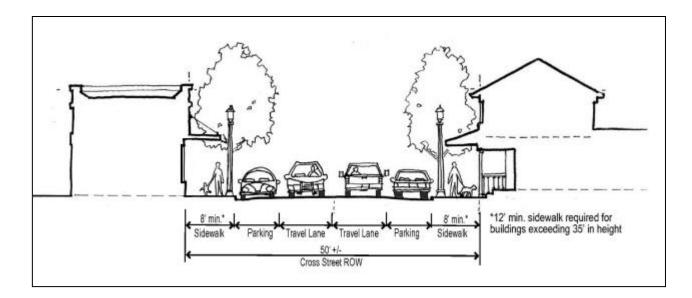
Z: Boones Ferry Typical Signalized Intersection Street Section
